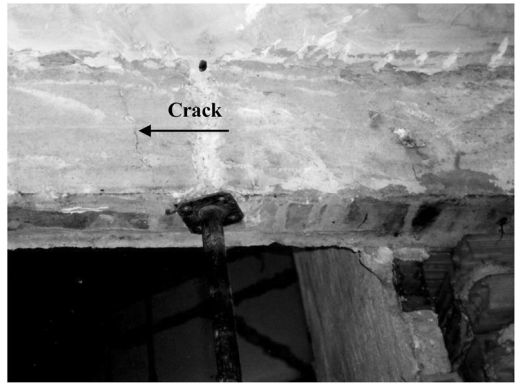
Typical damages in beams: passing cracks of constant width 1 mm.
